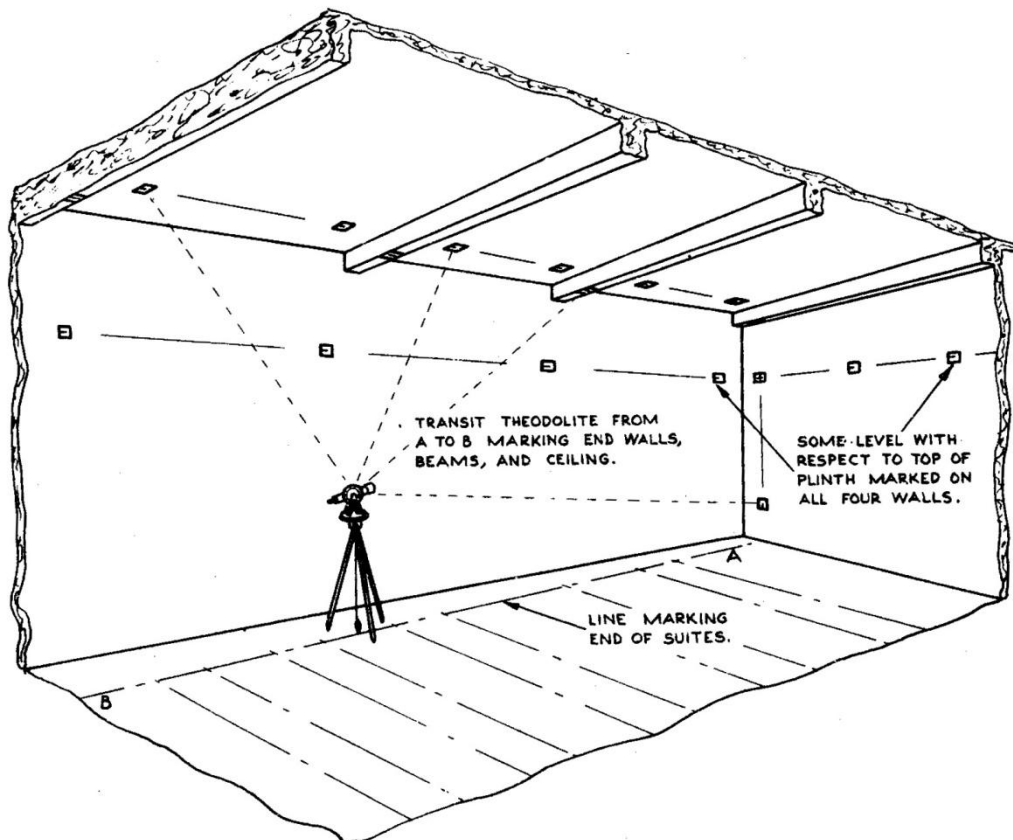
METHOD OF TRANSFERRING LEVELS TO WALLS AND OUTLINES TO CEILINGS.
